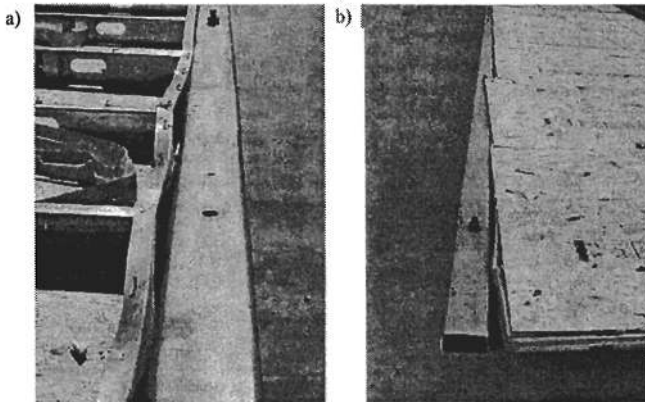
Bending of top plates: a) wall Amongyp, b) wall Amon.
